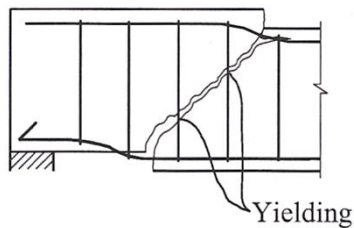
After shear sliding failure with yielding shear reinforcement in a reinforced concrete beam.
